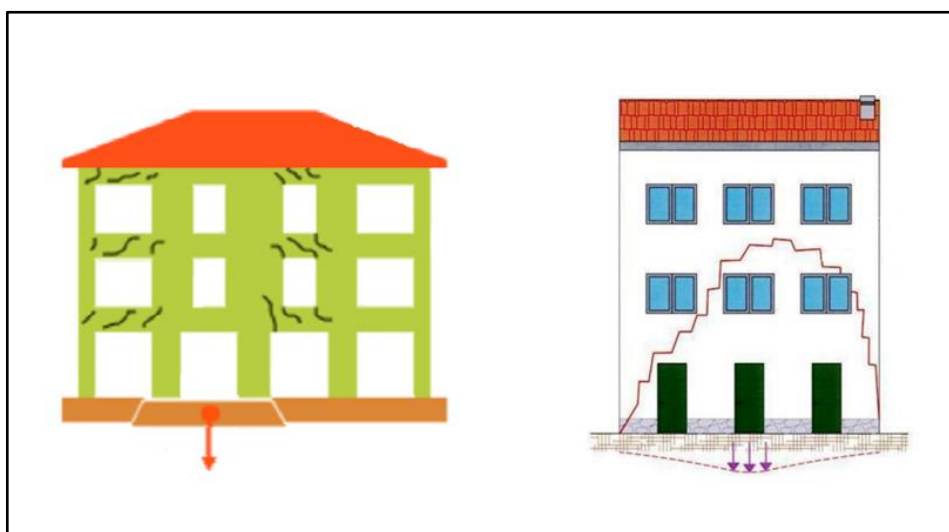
Examples of “arc-shape” cracks induced by “central” settlements of masonry wall (from Anzani et al., 2008).
